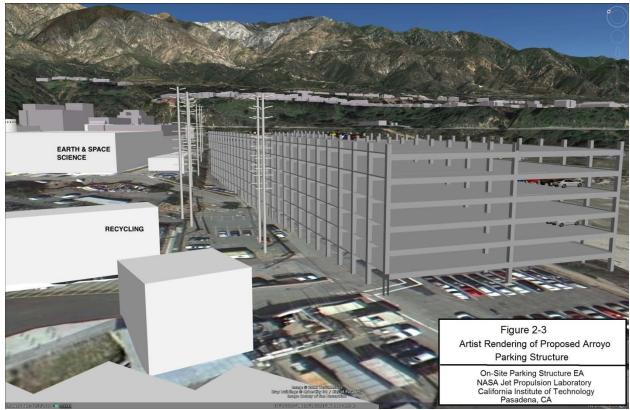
Artist Rendering of Proposed Arroyo Parking Structure
